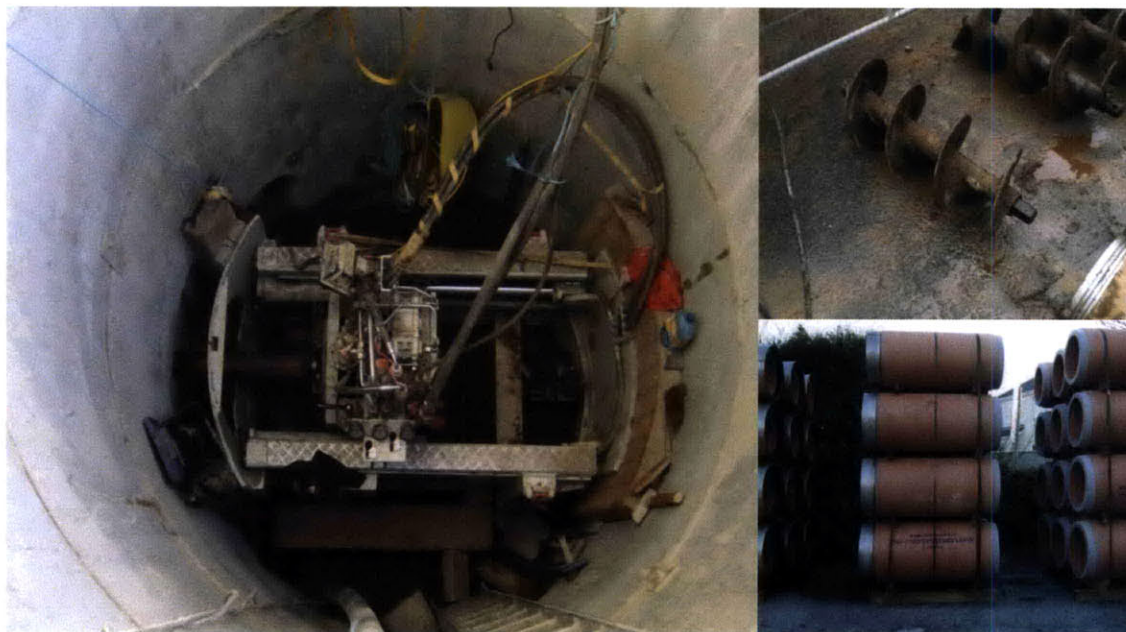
Auger boring equipment used in Skibbereen; Launch shaft and jacking frame, augers, and clay pipes.
